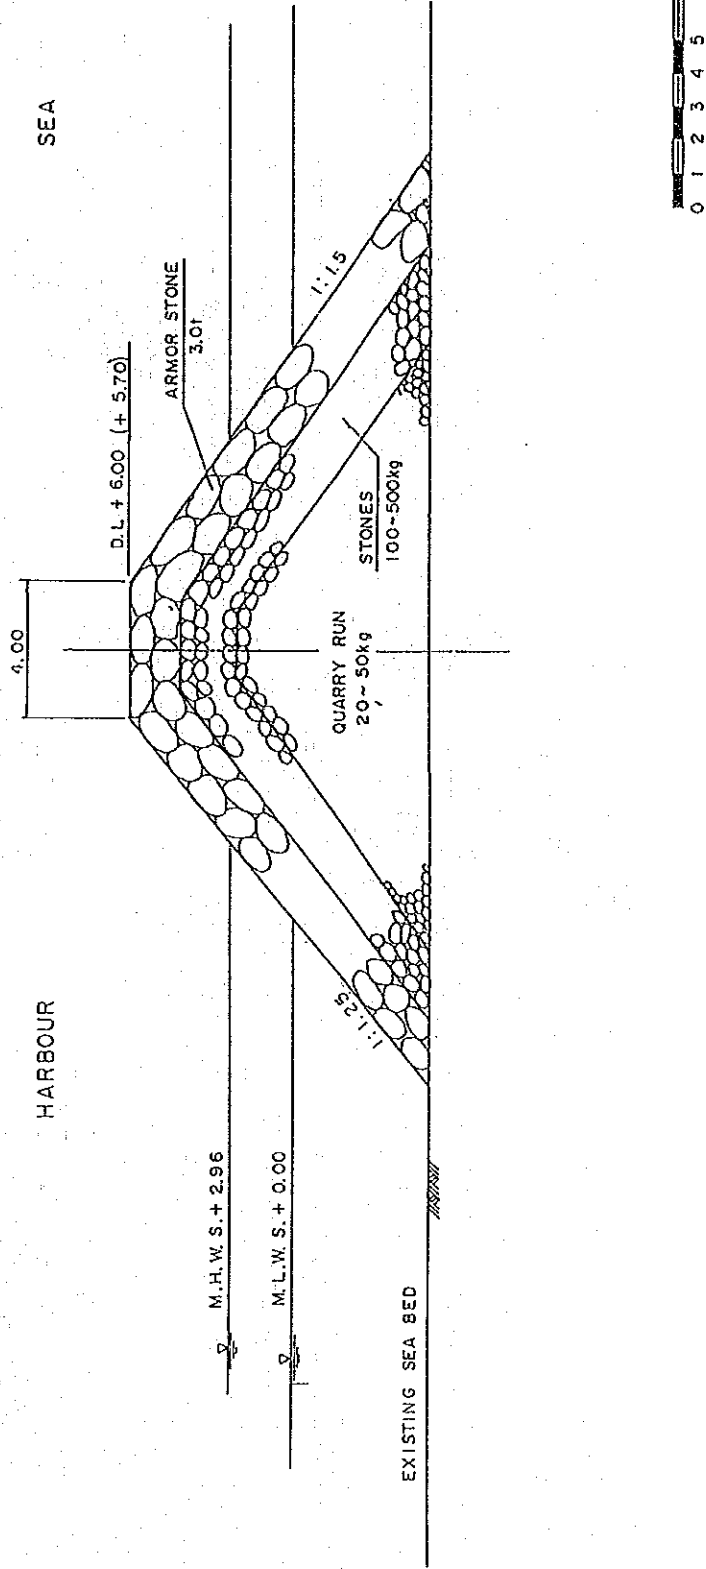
Typical Cross Section of Breakwater (2)
